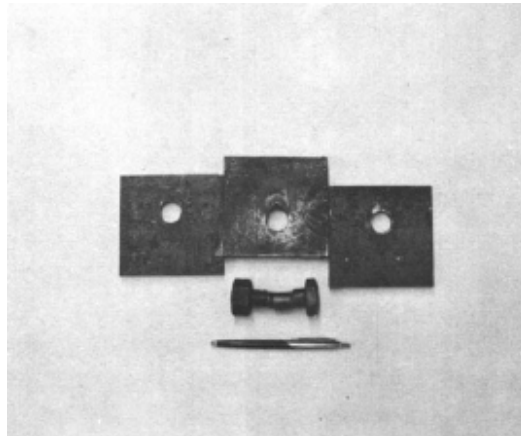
Photograph of fractured bolt in column cover connection (Crawford and Kulak, 1968)
